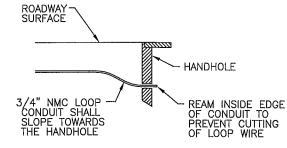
DETAIL FOR LOOP INSTALLATION IN NEW ROADWAY
